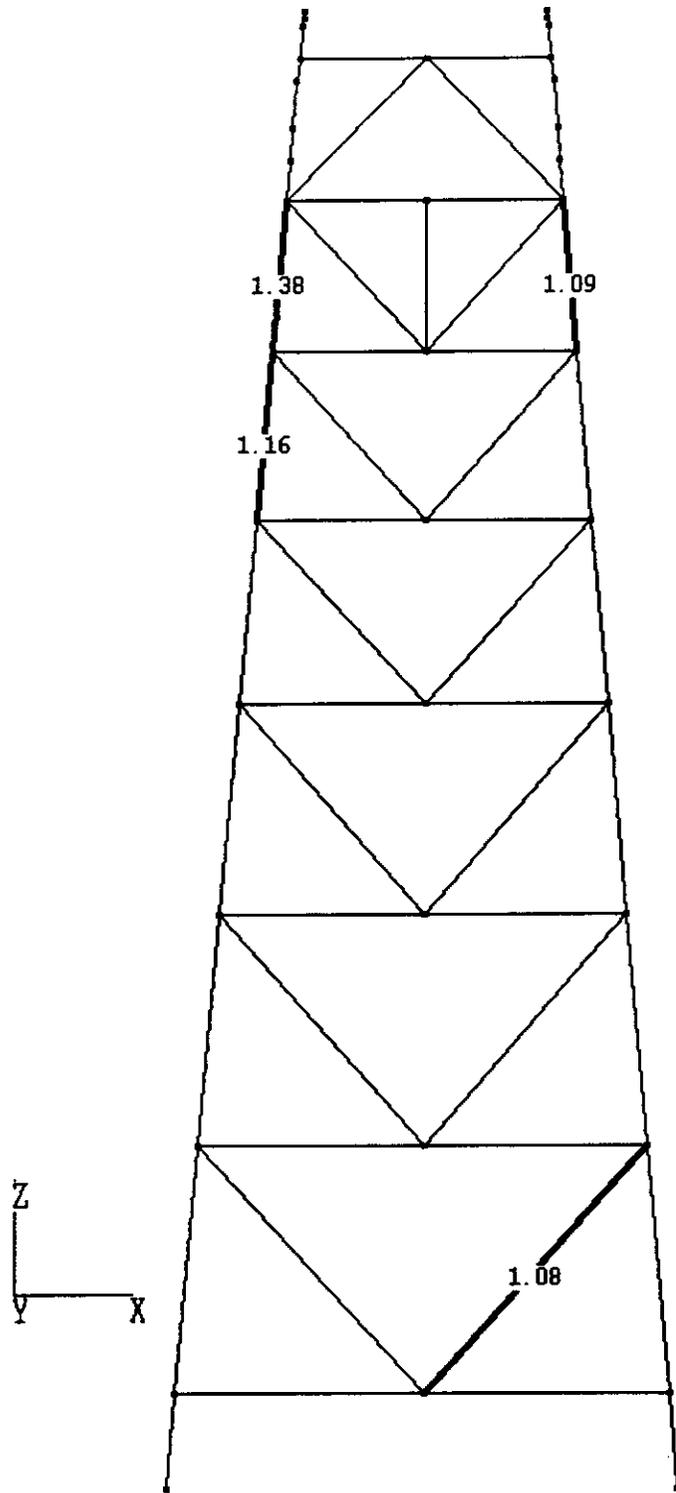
Benchmark Platform - Column Row 1 - Jacket"
